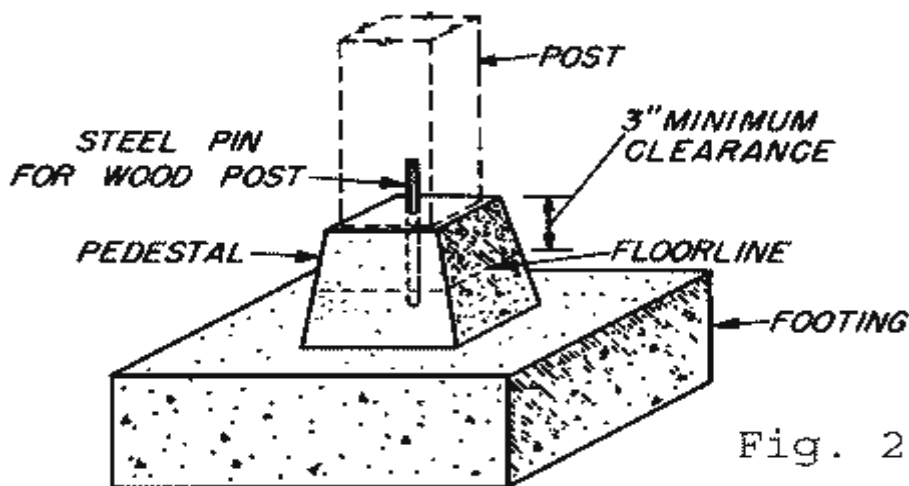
Footing Pedestal (Foundation Footings, n.d.)
